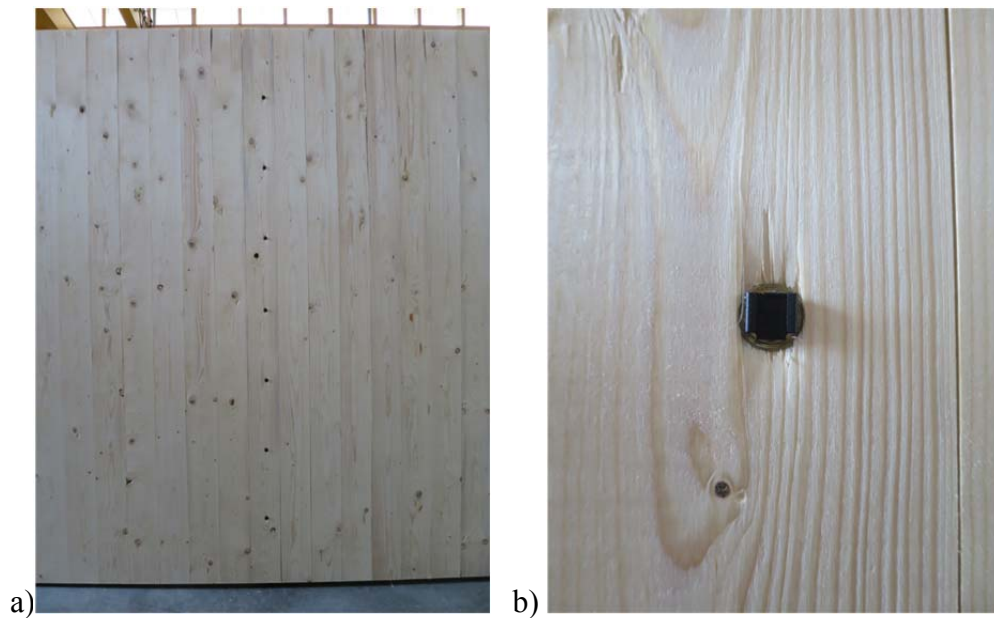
Measurement positions for determination of horizontal in-plane components for the separation wall
